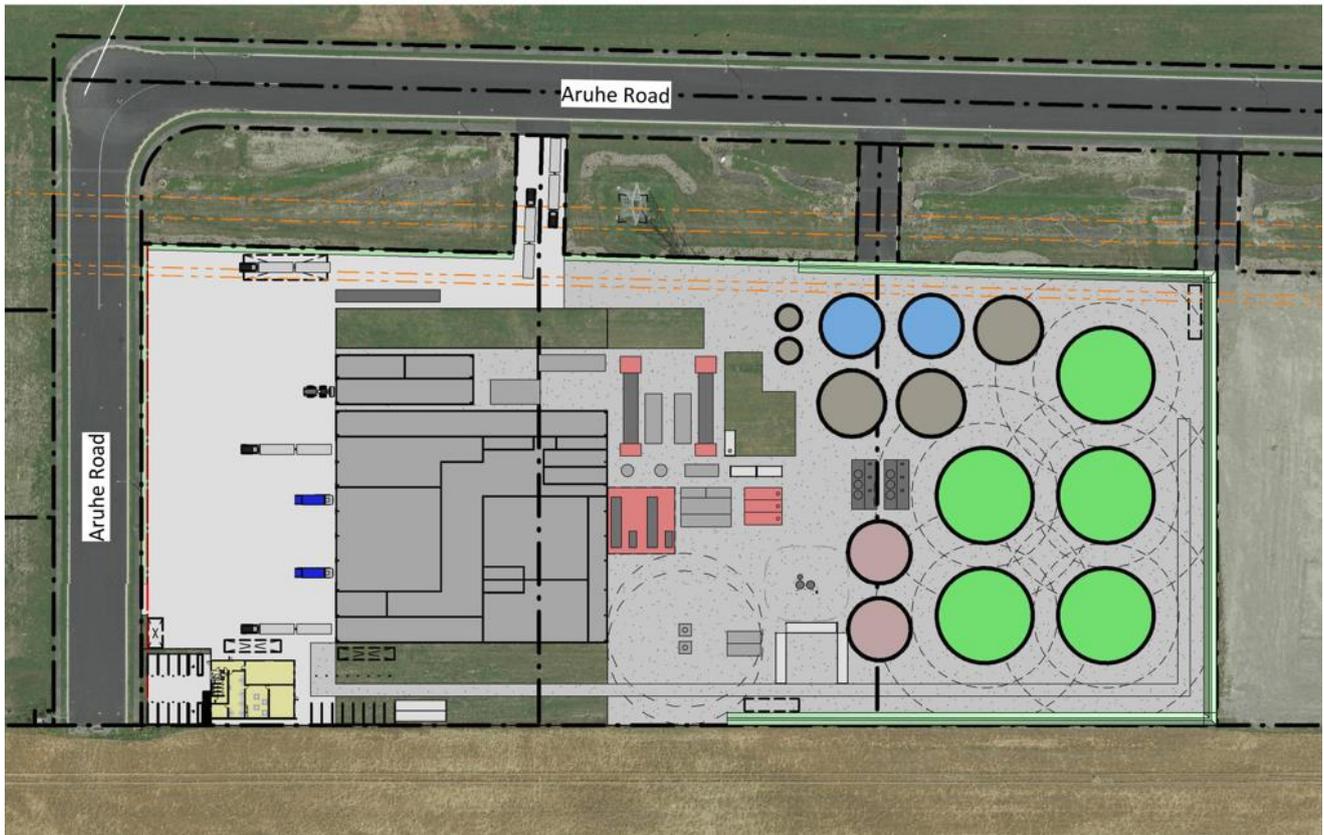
Site Plan (Source: Ecogas, 13 May 2024)
